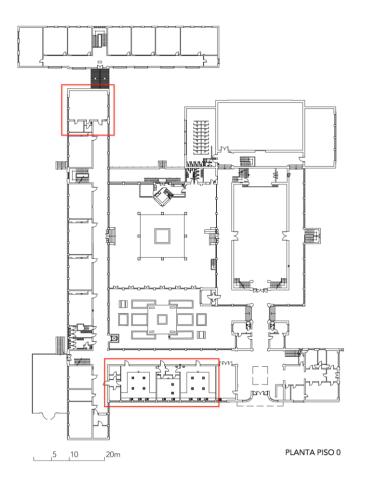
"Liceu" Diogo de Gouveia building plan, ground floor (Parque Escolar, 2010, p. 163)
